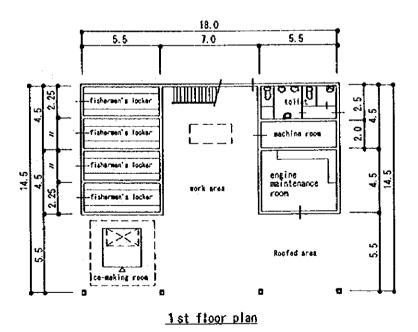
Plan of Artisanal Fisheries Support Station at Okat
